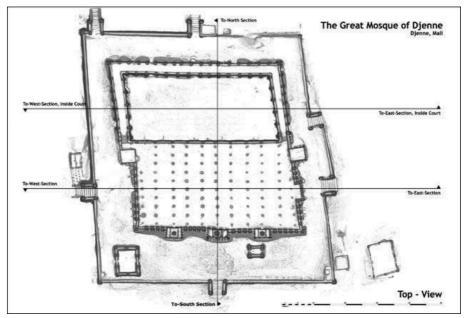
Floor plan. Source: Djenné mosque (zamaniproject.org).
